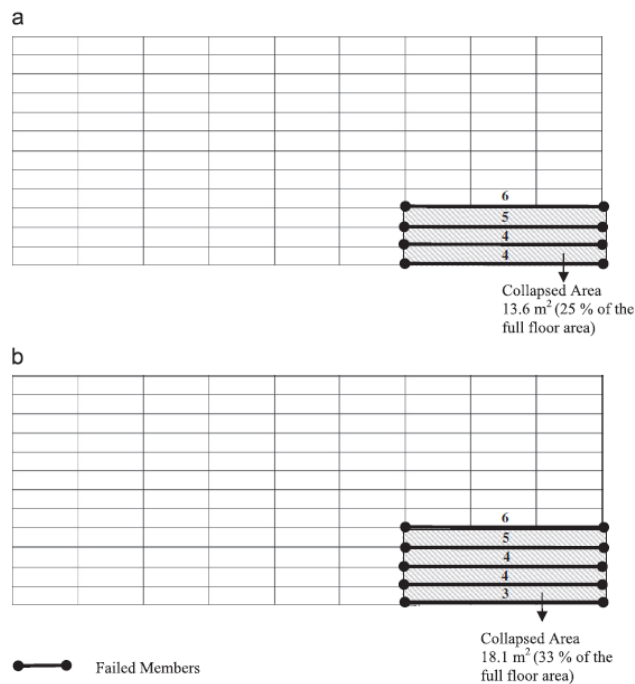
Sequence of the failure of the joists for Case 5: (a) second-floor joist beam plan and (b) third-floor joist beam plan [9].
